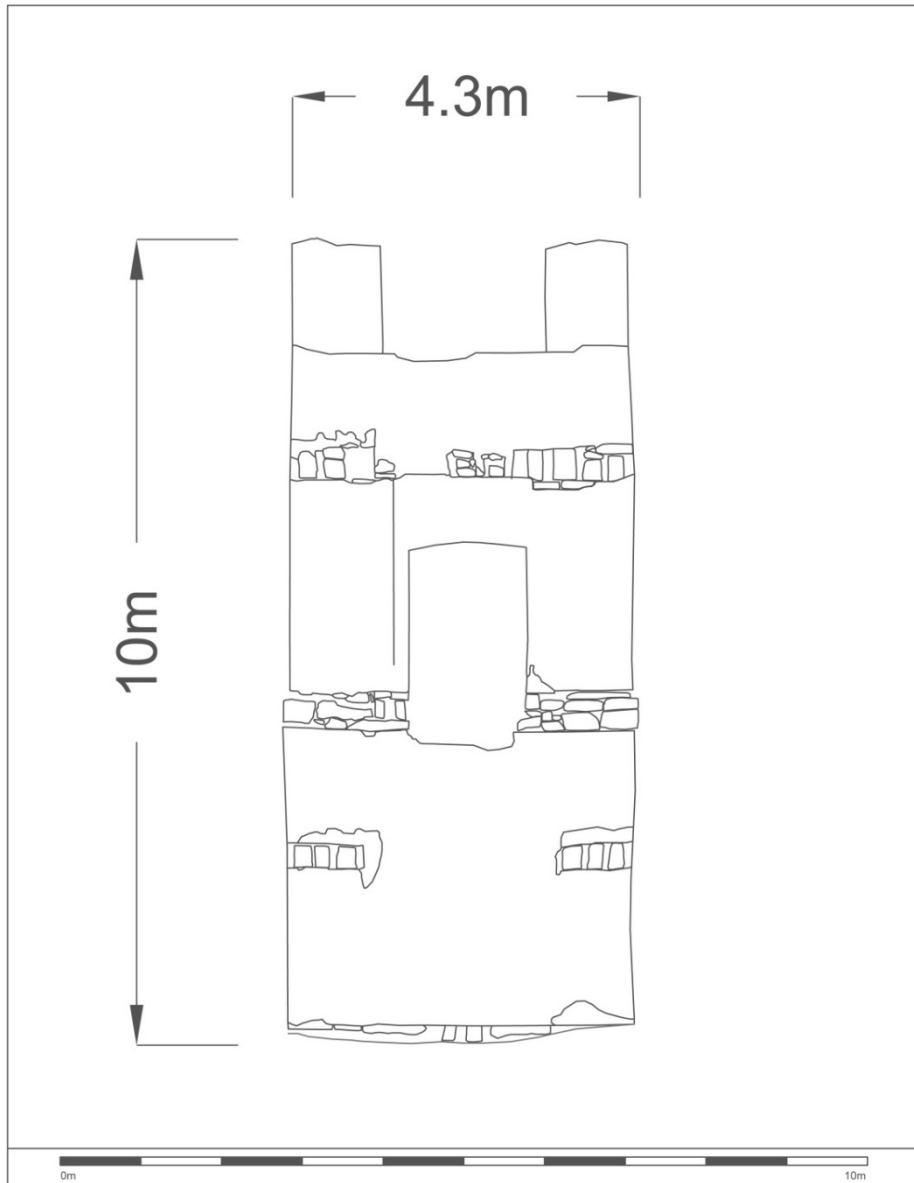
Internal elevation of the south-west wall of the signal tower at Inisheer Signal Station.
